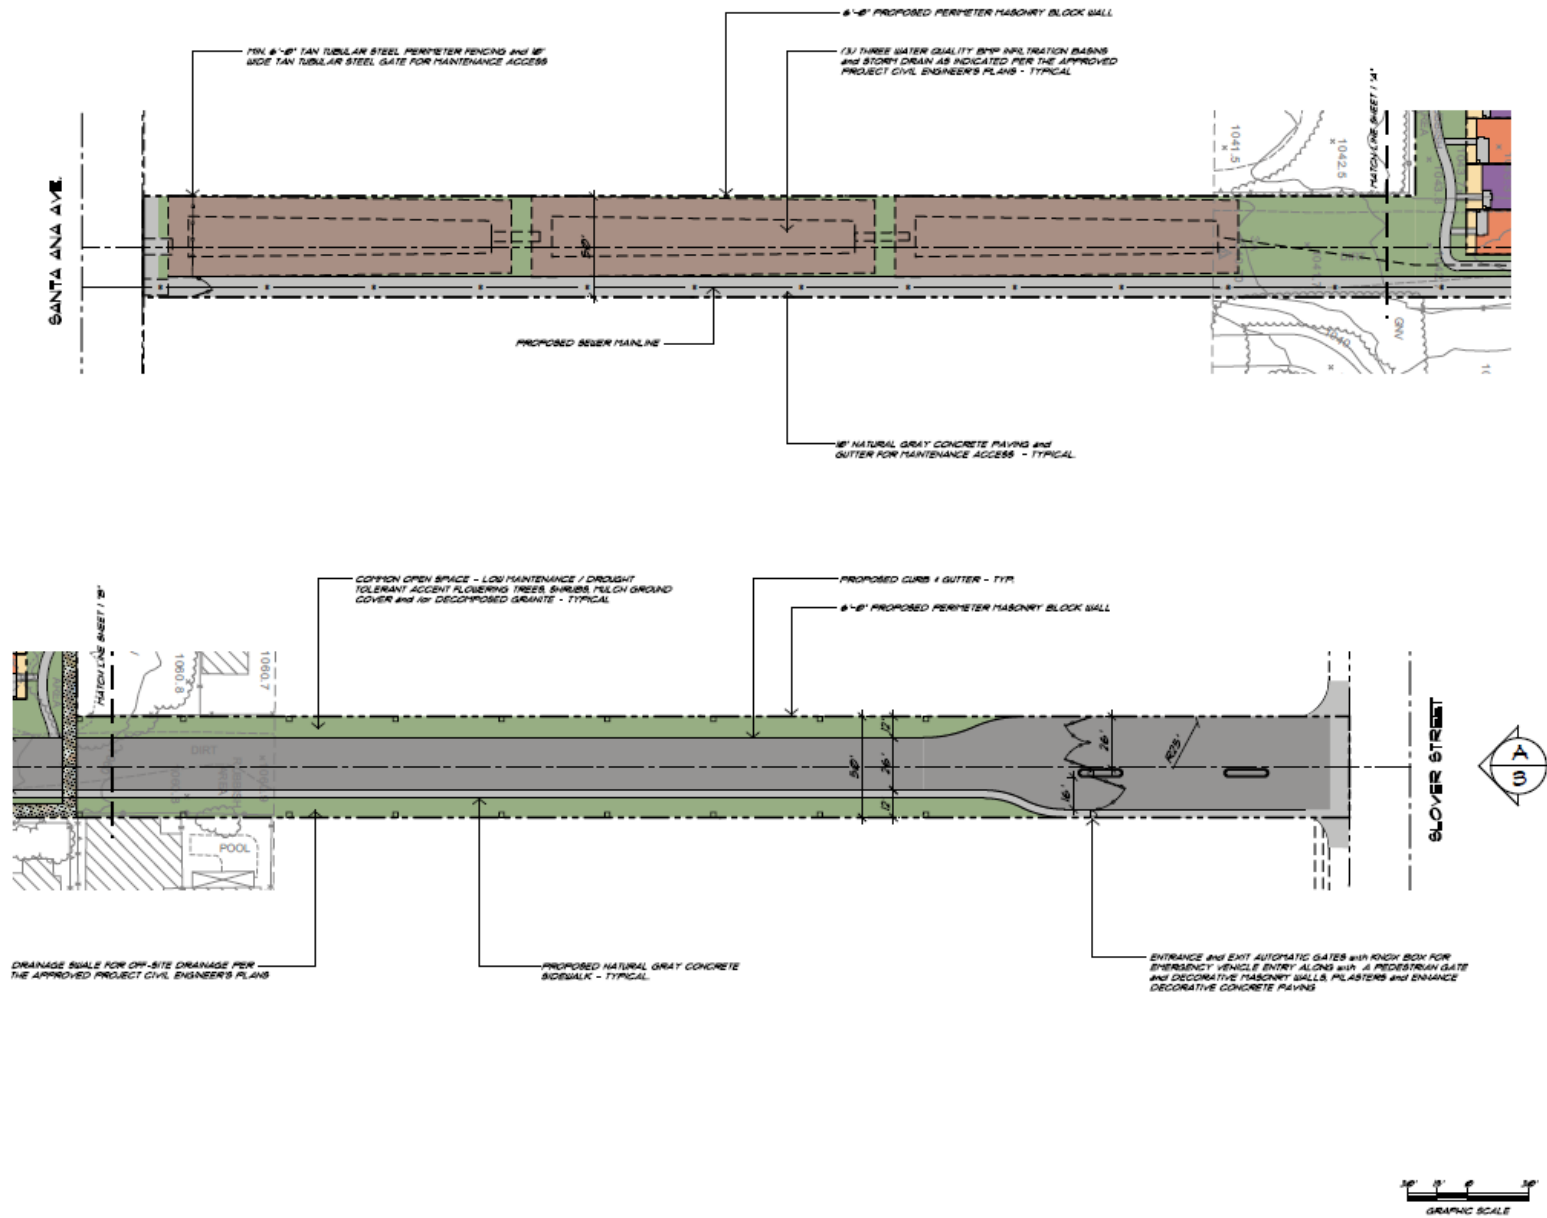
Access north to Slover/Drainage Basins south to Santa Ana
